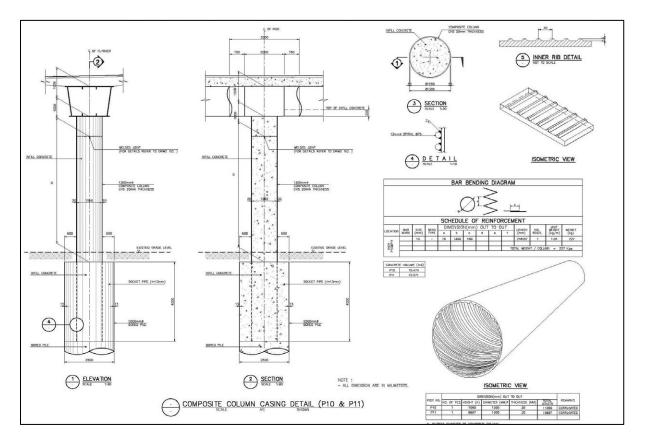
TYPICAL ONE COLUMN PIER
